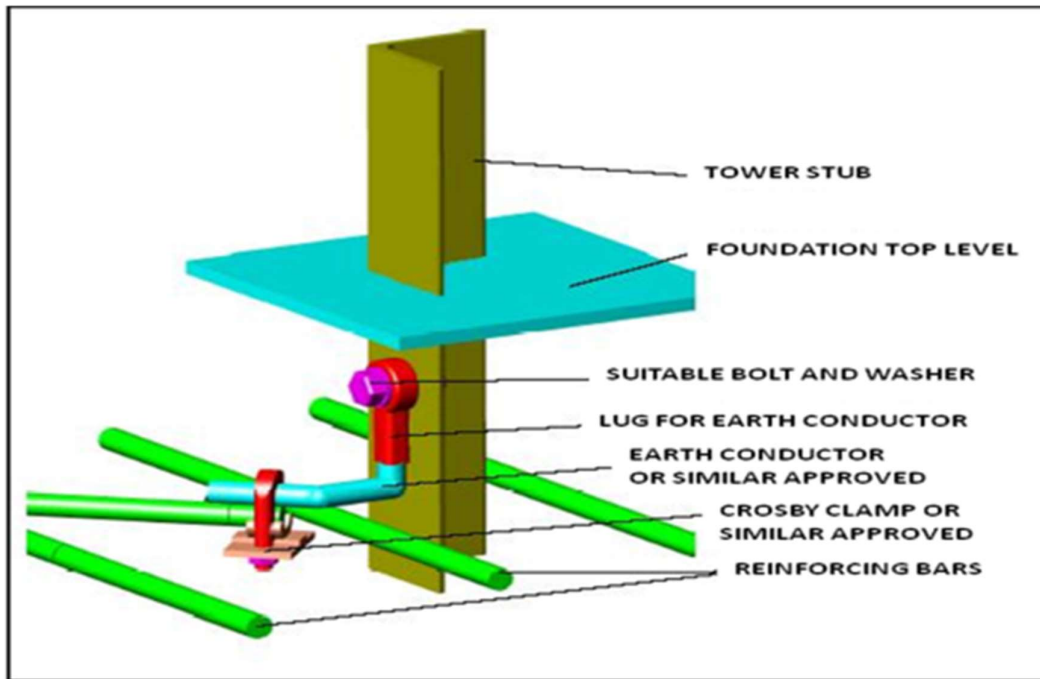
Connection between Self Supporting Tower Steel and Main Reinforcing Bar
